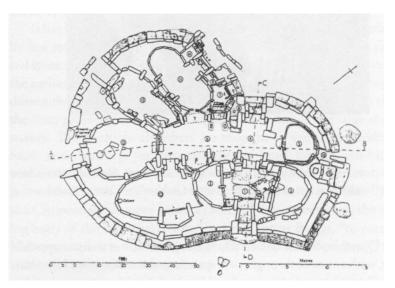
Floor plan of temple at Hagar Qim, Malta, c. 4000-3500 BCE.
